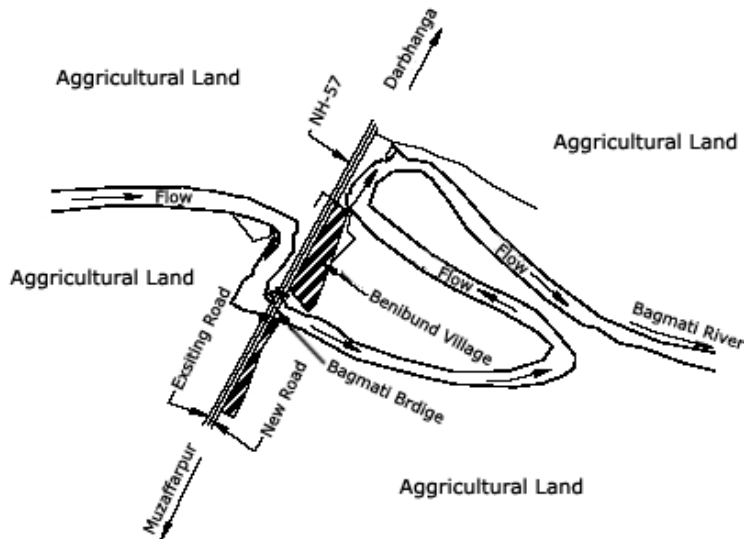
Plan view of River Bagmati showing Sharp Bends u/s and d/s of Bridge on NH-57
